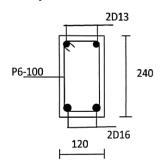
Cross Section of Beam Specimens (unit in mm)
